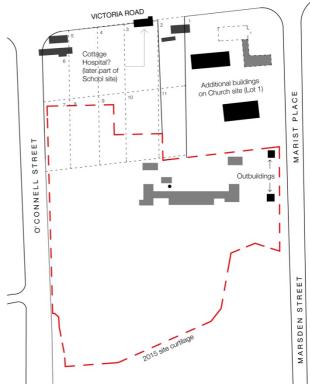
Plan showing phases of development, c1840 Tonkin Zulaikha Greer Architects, adapted from 1994 Conservation Management Plan.
